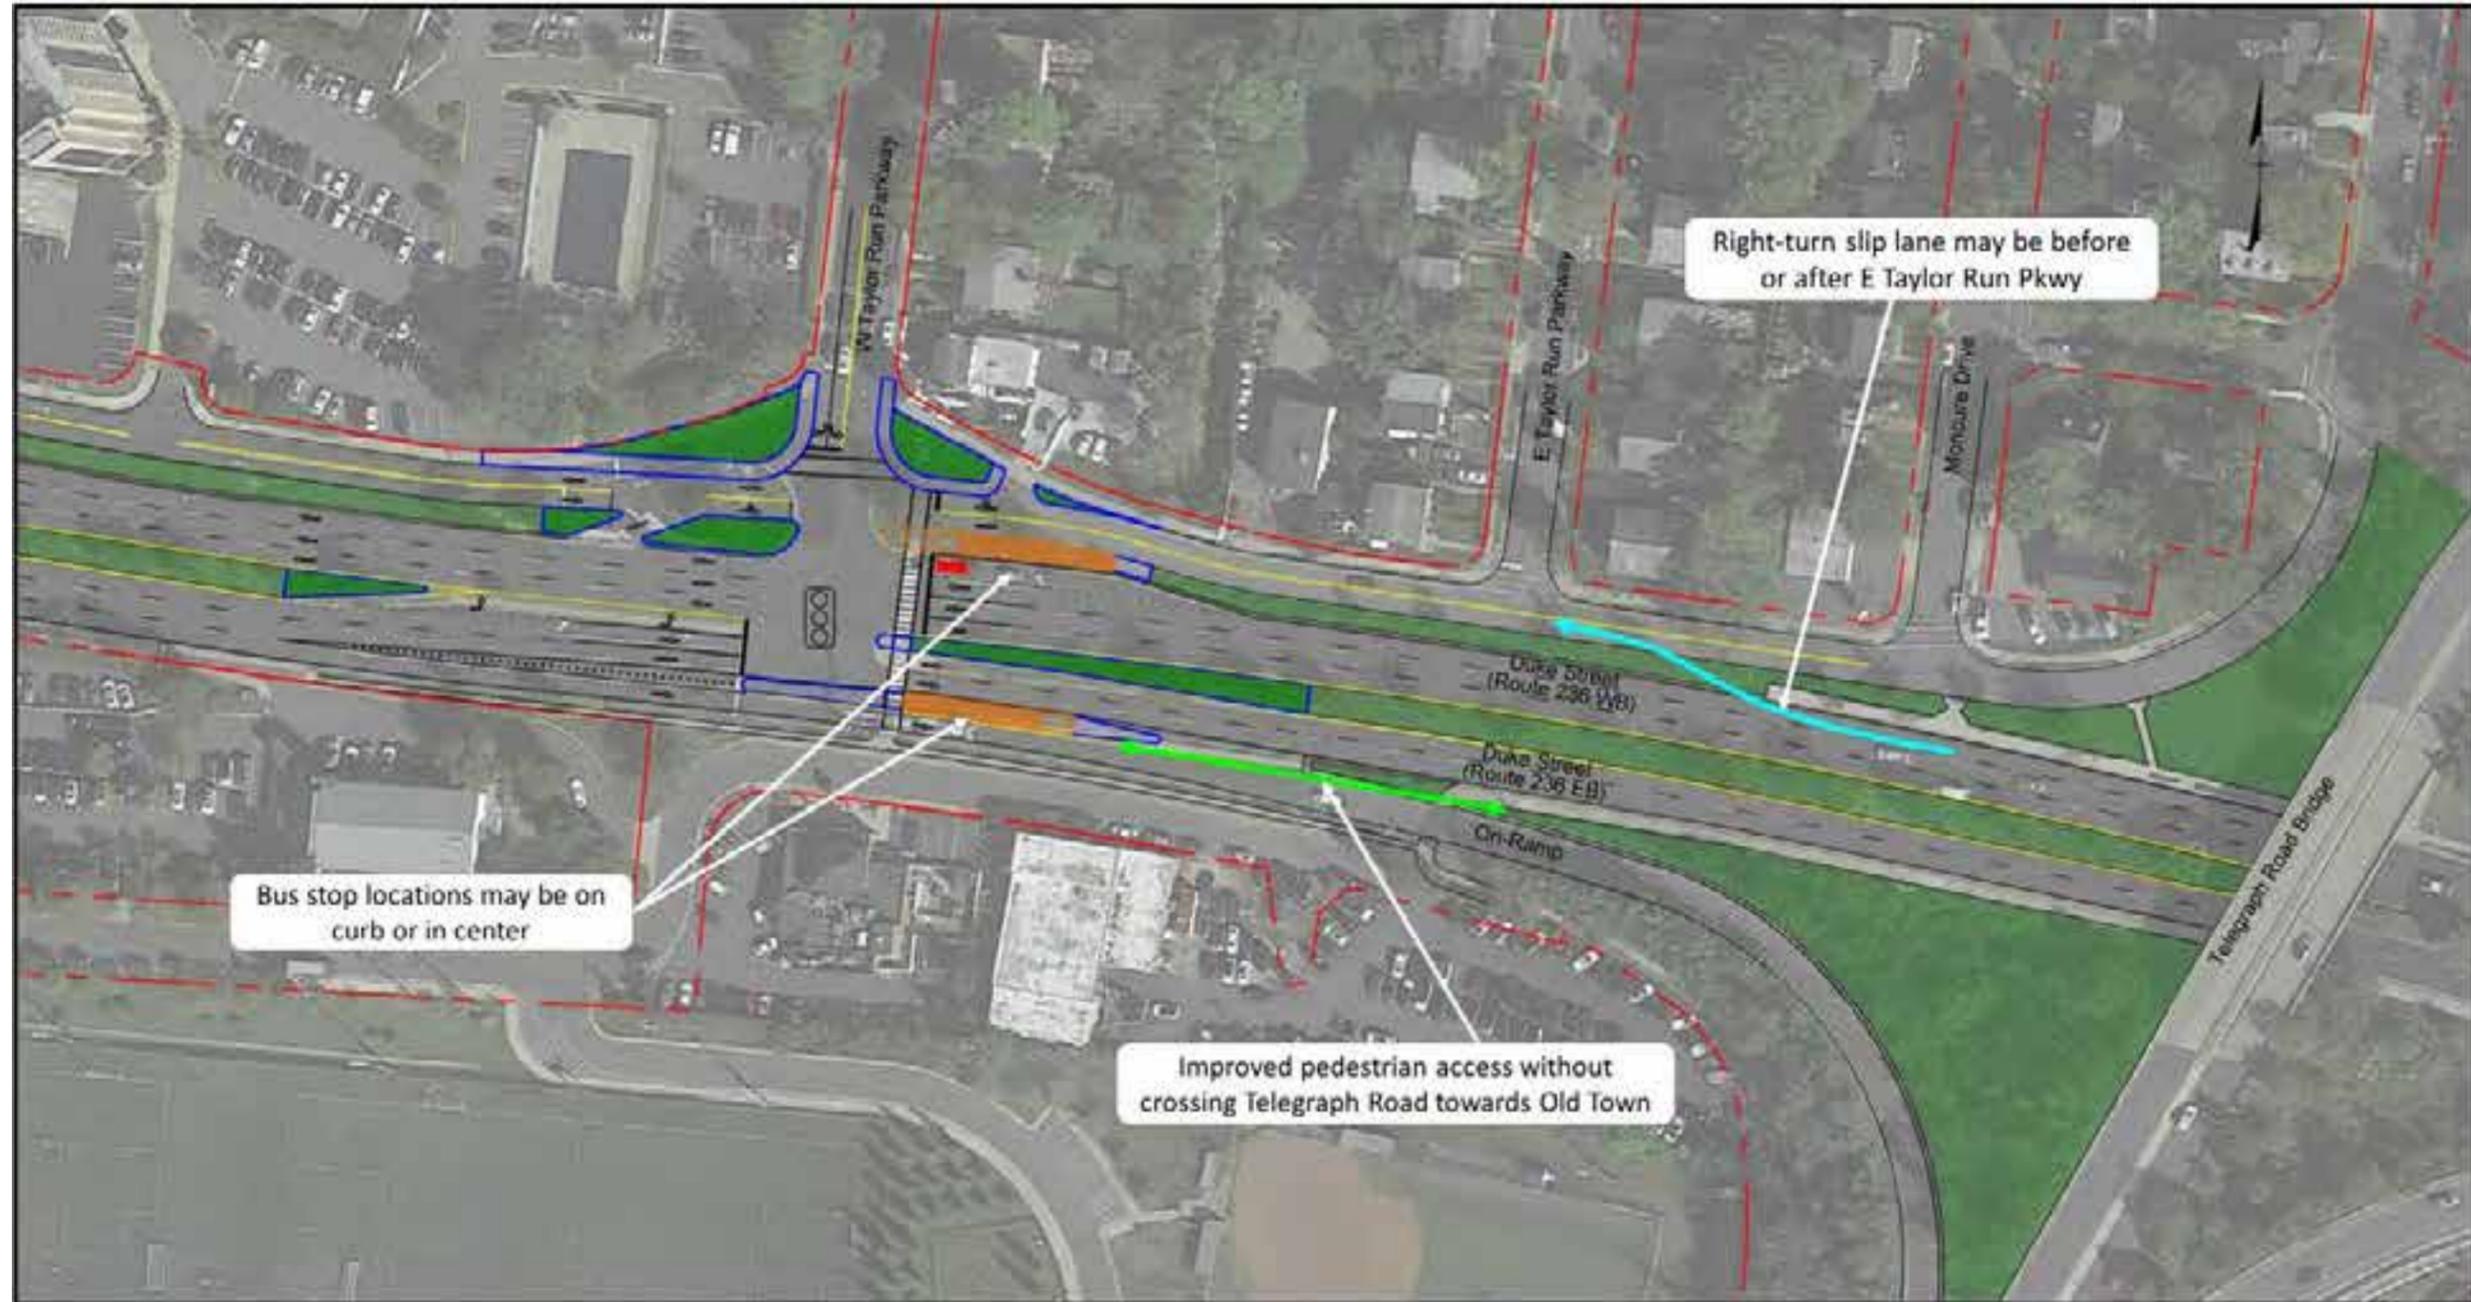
Duke Street eastbound and Telegraph Road on-ramp new, and Telegraph Road on-ramp at New Ramp from eastbound Duke Street concept for Alternative 2
